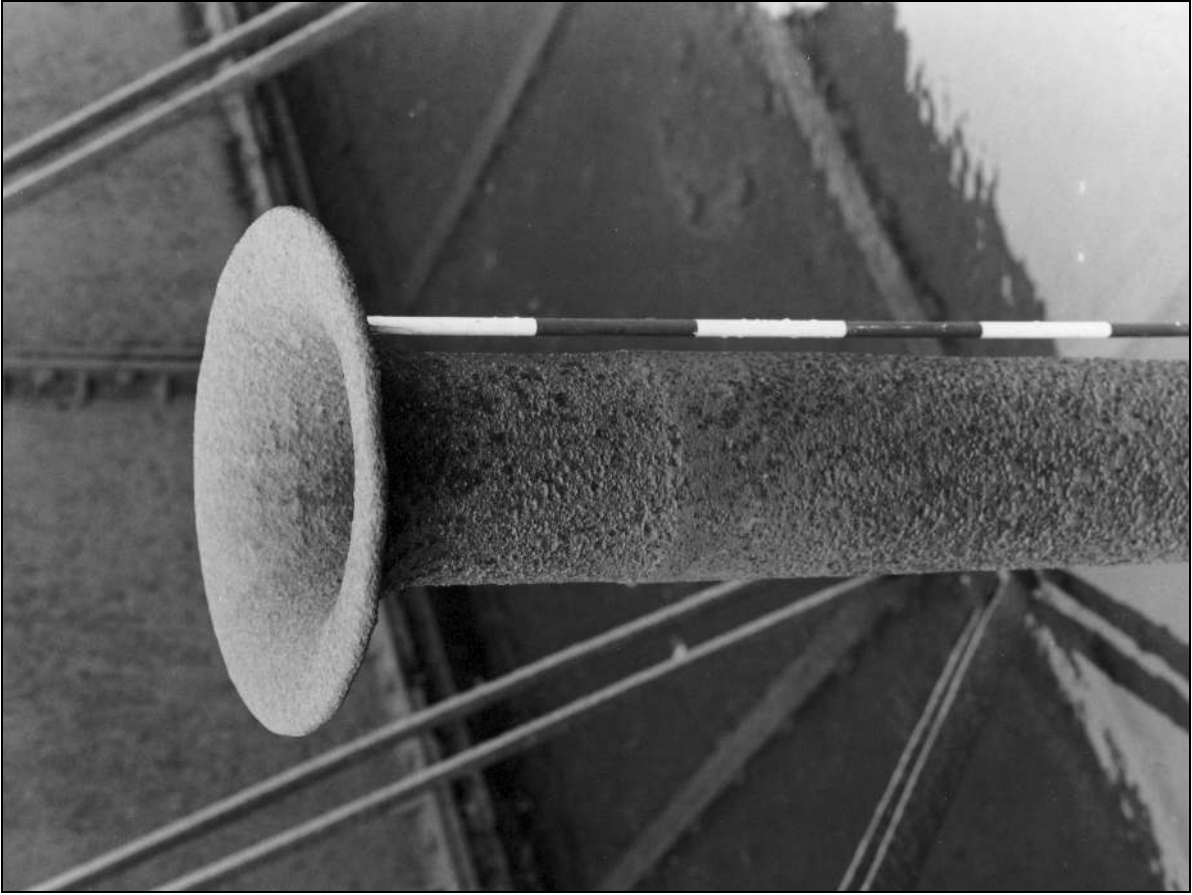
Detail of overflow pipe, from the south-west (film 7, frame 11)
